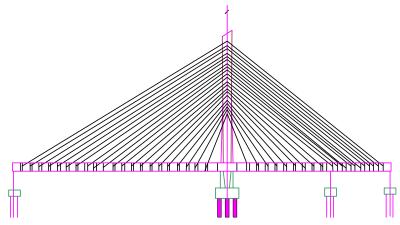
The diagrammatic figure of concrete deck cable stayed bridge.
